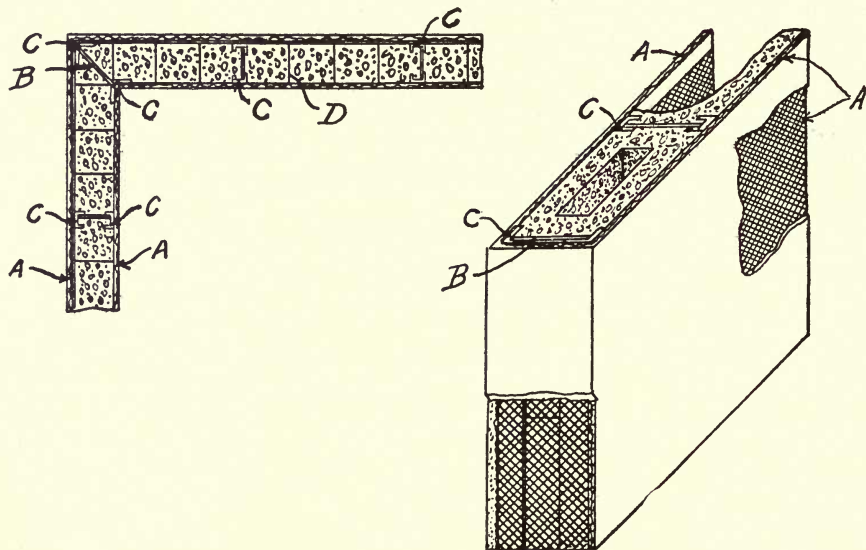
Lea's Concrete Metal Wall Construction. (See p. 195.)
